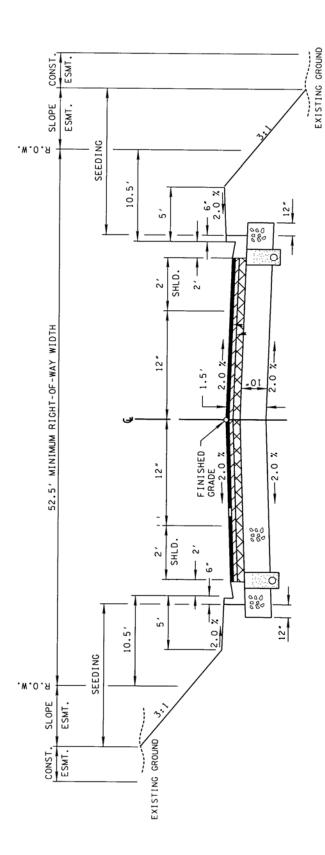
A-1. Portion of Typical Sections Sheet (Road Section)
